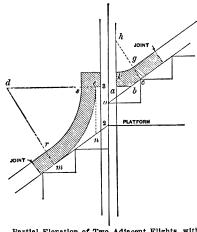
Partial Elevation of Two Adjacent Flights, with Newel Between.
